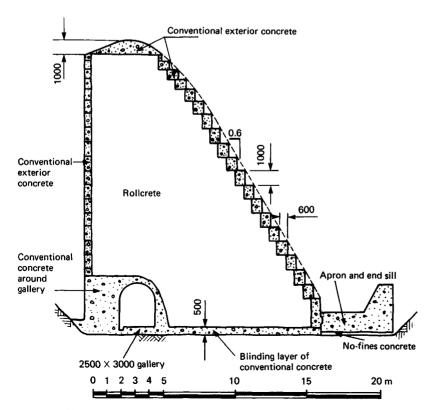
De Mist Kraal weir. Typical section through spillway
